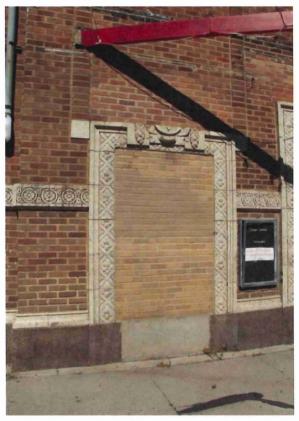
Detail of the altered doorway including removal of the original terra cotta door hood. Note the various terra cotta ornamental panels around the door and extending horizontally across the facade.
